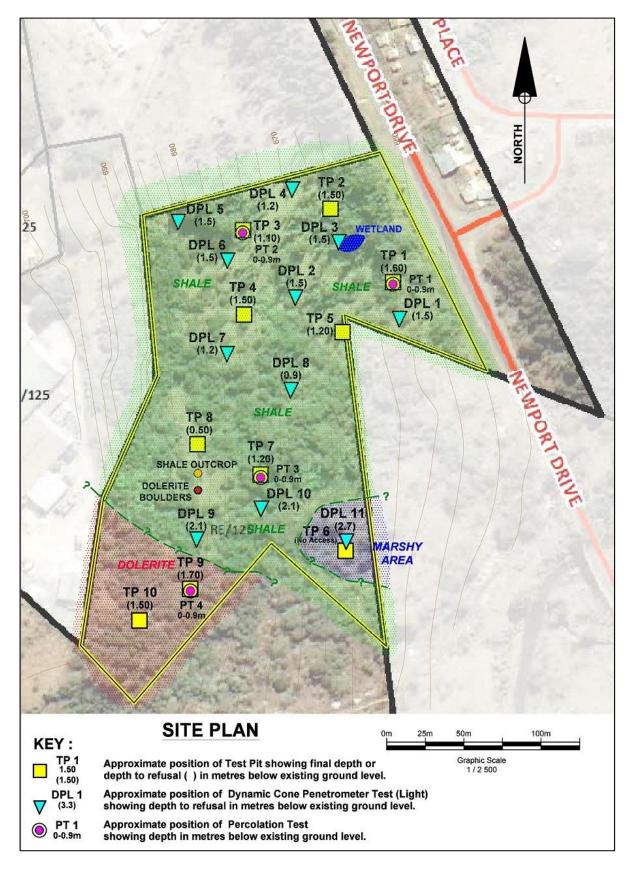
Site Plan showing layout of site and positions of Geotechnical Tests
